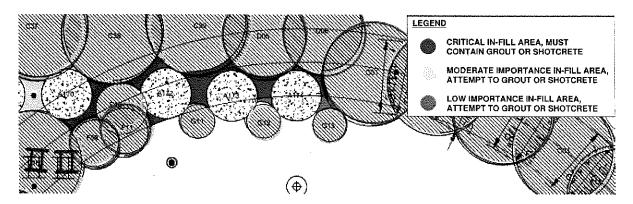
West Shaft Wall Pile As-built (Potential Void Areas Highlighted in Yellow or Hatched)
